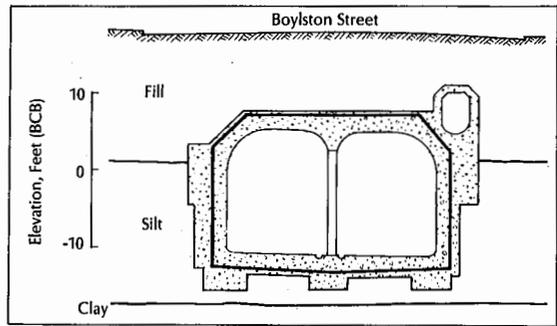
A cross section of the Boylston Street Subway at Sta. 58+00 between Berkeley and Clarendon Streets (Ref. 21).
